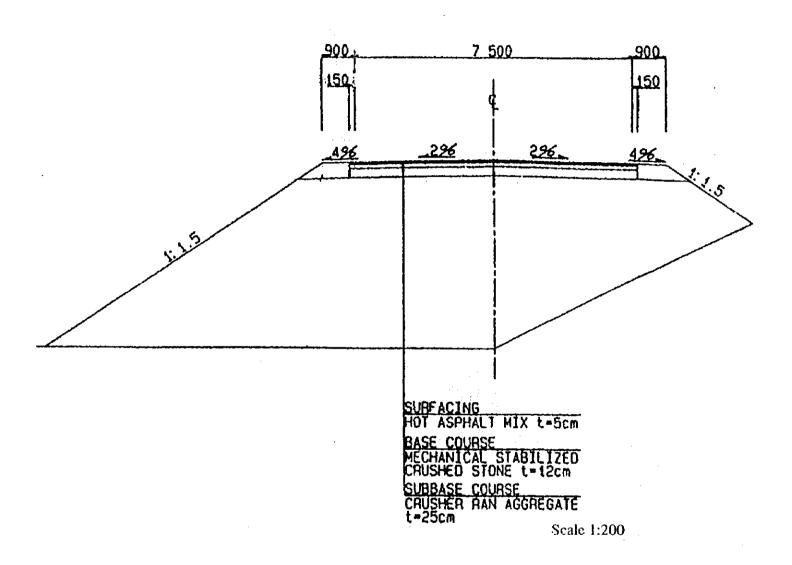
Typical Cross Section of Approach Road on the Embankment
